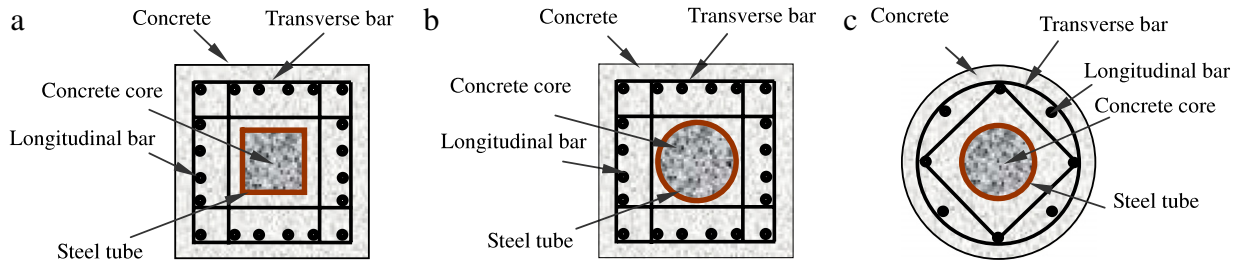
Typical concrete filled steel tube reinforced concrete (CFSTRC) column cross-sections.
